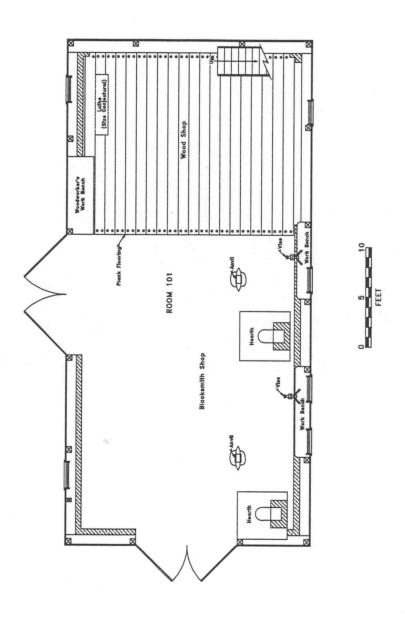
Ground floor plan of the Baumbauer Blacksmith Shop, as originally constructed.
